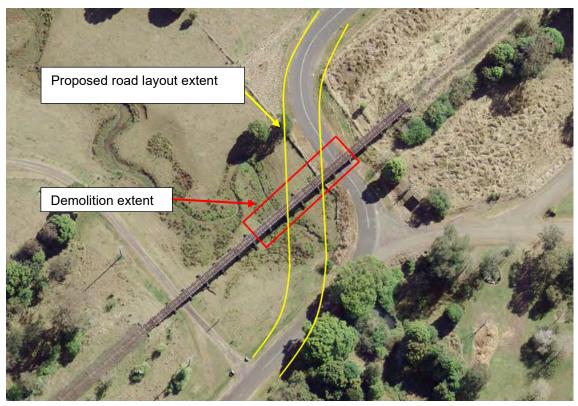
Winterton Parade – Demolition extent, spans 8 to 14 (Source: FBE)
